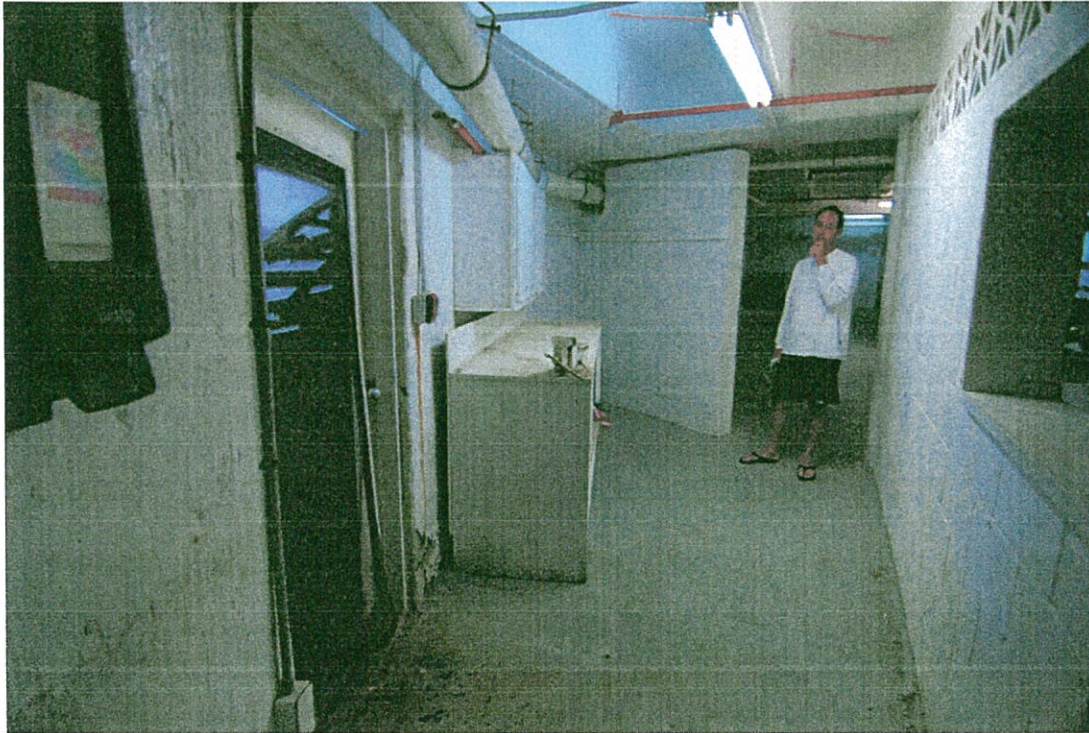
VIEW OF ENCLOSED AREA AT ENTRANCE TO PARKING GARAGE ADJACENT TO NORTH END OF POOL AND DECK
